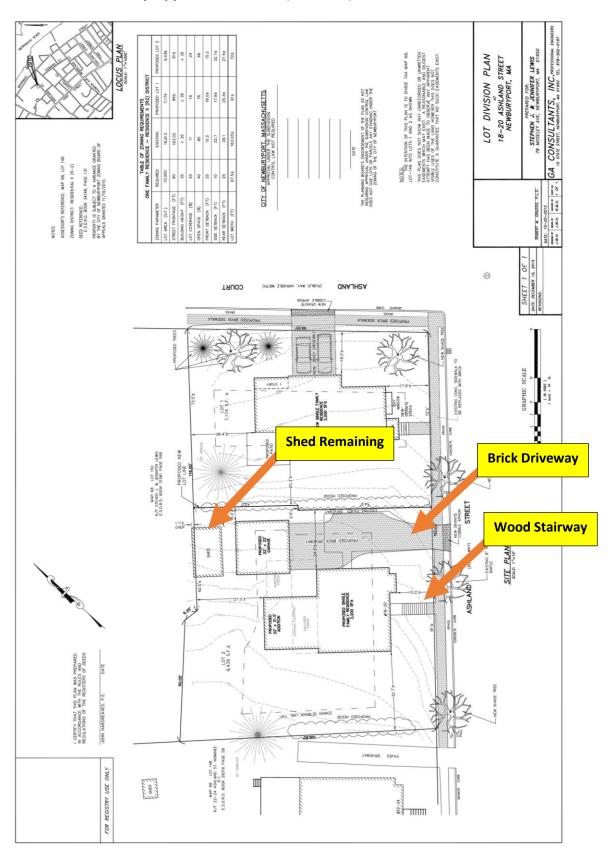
Proposed Site Plan Highlighting Proposed Changes (2-23-20)
